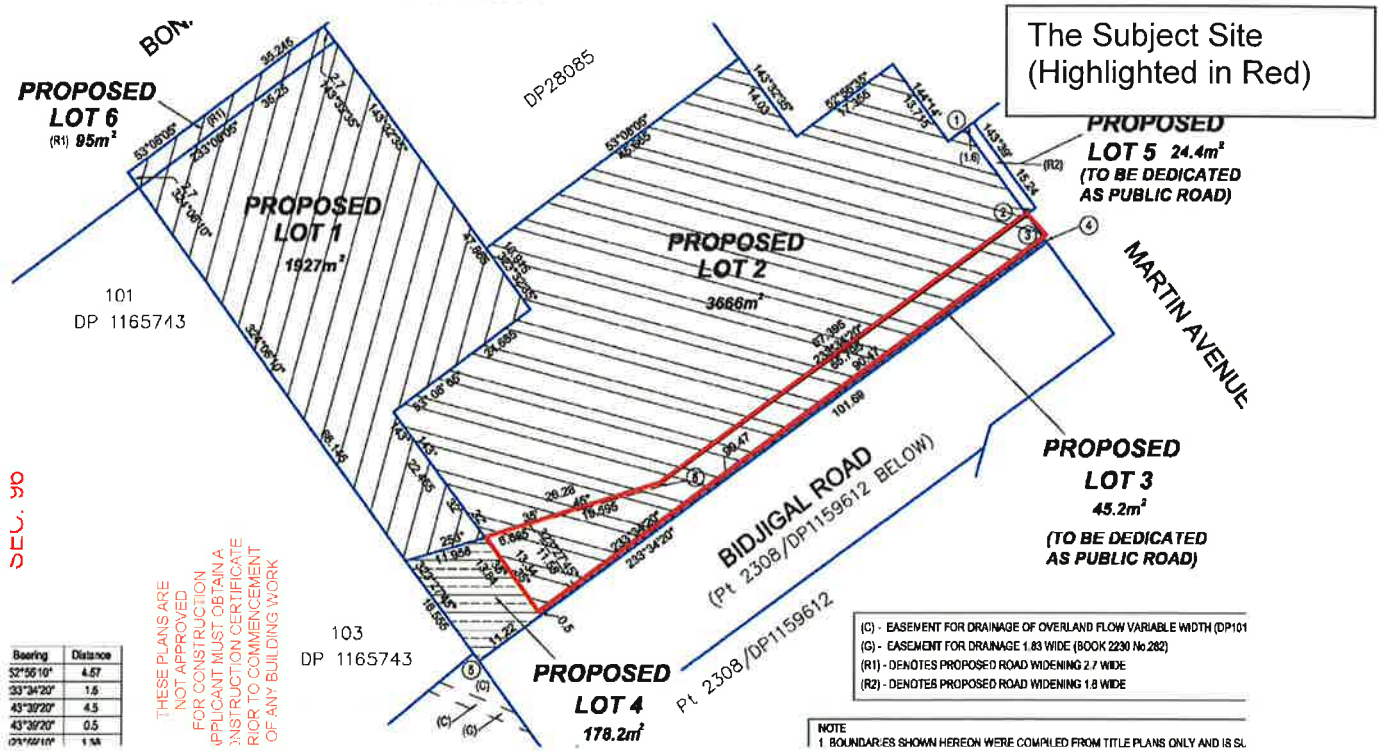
Plan of Subdivision approved under DA2015/421/A (Source: Bayside Council)
